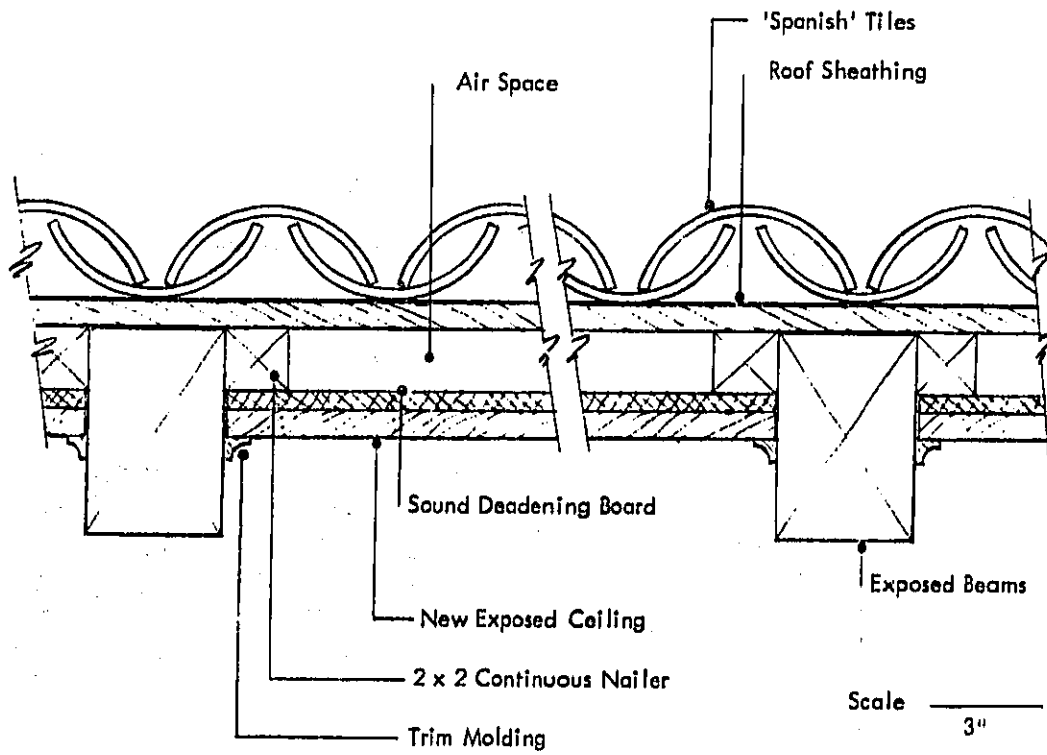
EXPOSED BEAM CEILING - STAGE 2, SPANISH TILE ROOF
